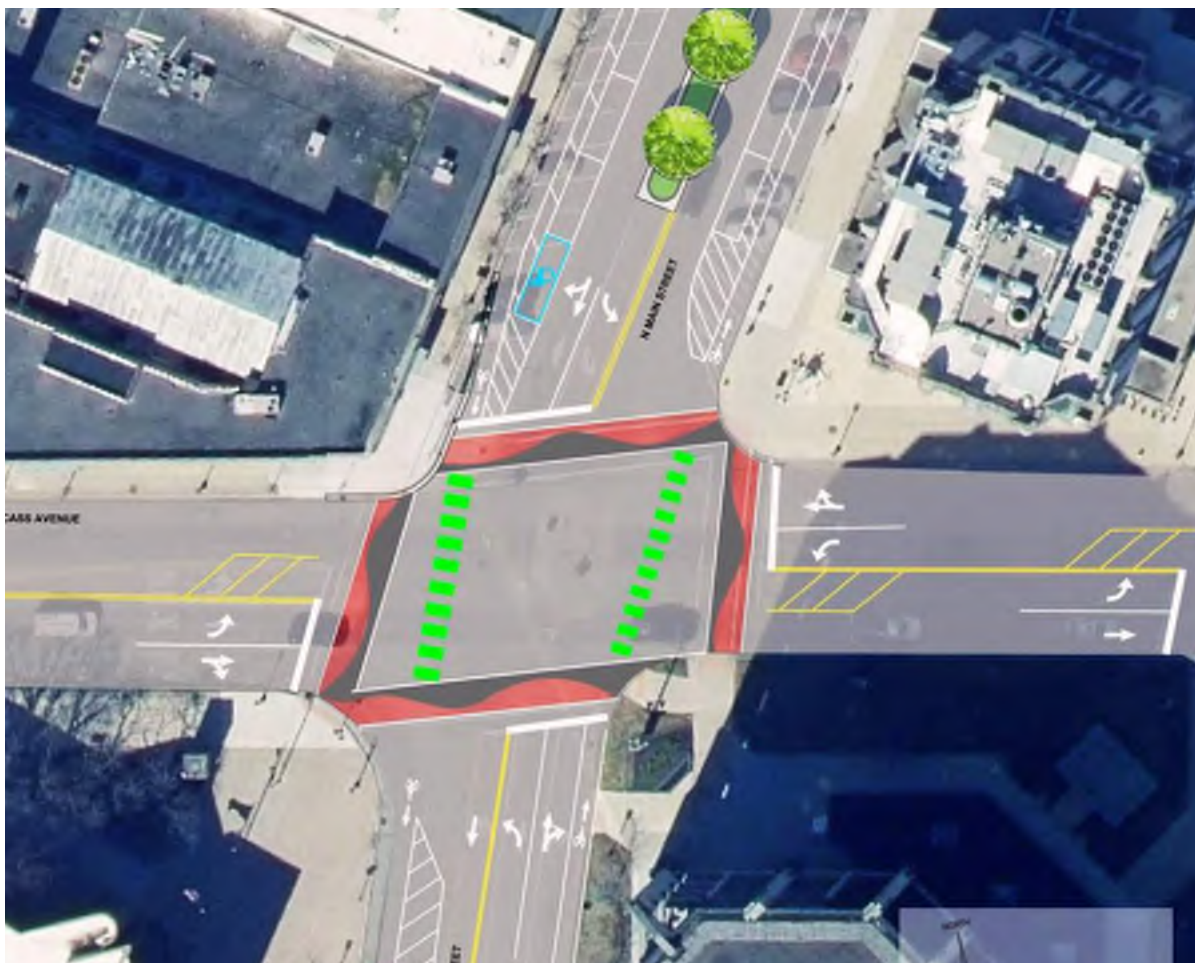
CONCEPT PLAN CASS AVENUE
